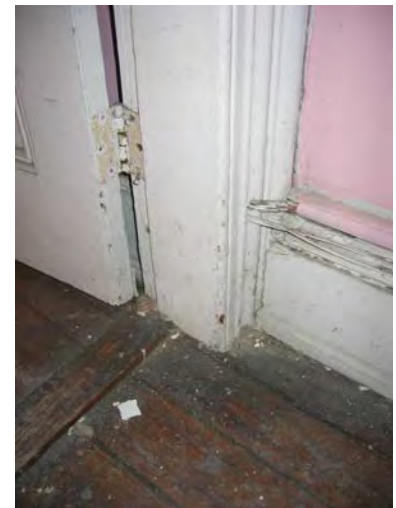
Base detail at door D108 door frame. (Photo: BBB, 2007)
